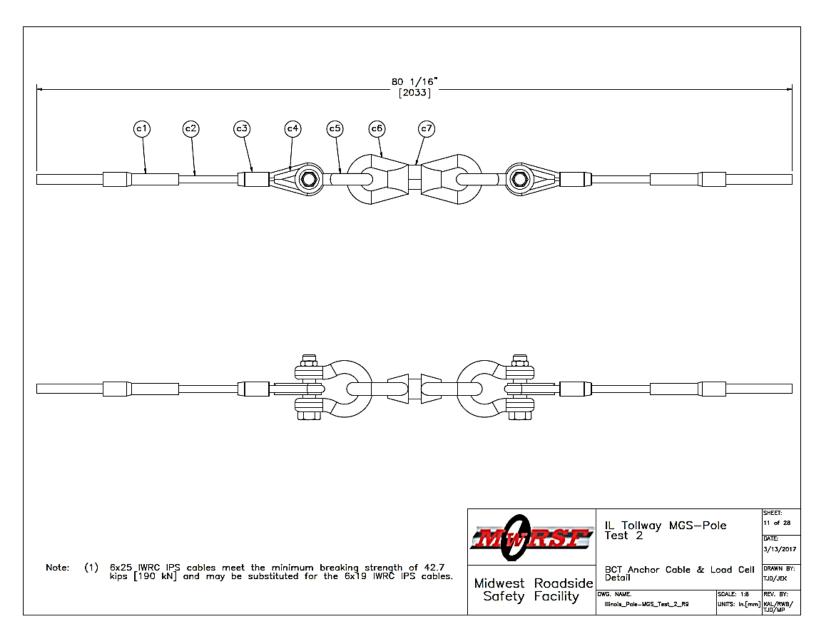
BCT Anchor Cable and Load Cell Detail, Test No. ILT-2
